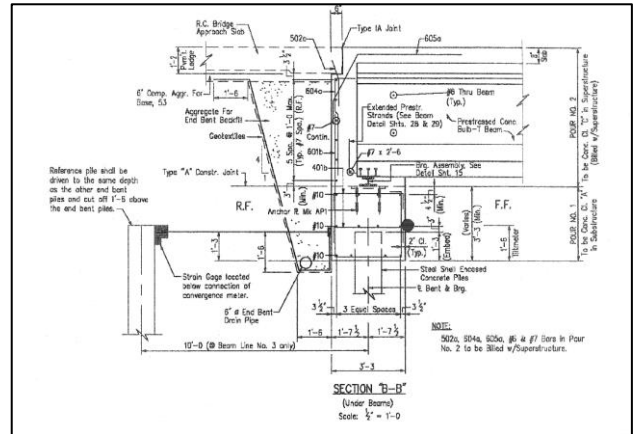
SR-18 Abutment Cross – Section (Chovichien, 2004)
